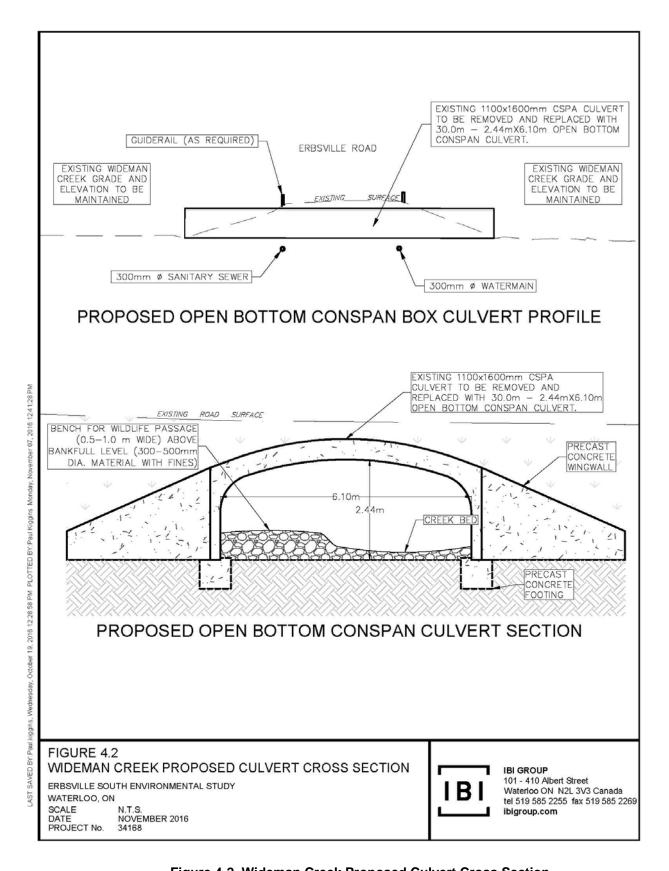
Wideman Creek Proposed Culvert Cross Section
